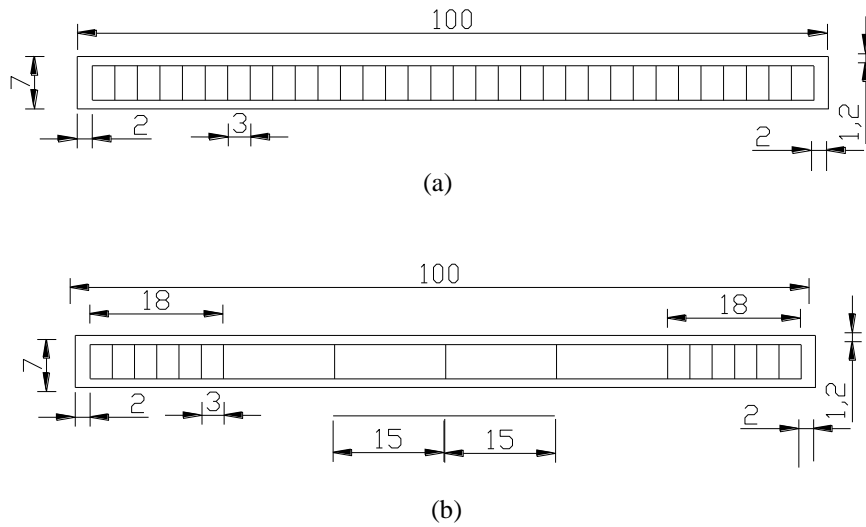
Reinforcement details (a) reinforced concrete flexural element (b) concrete with only bending reinforcement and concrete with bending reinforcement and steel fiber flexural element
